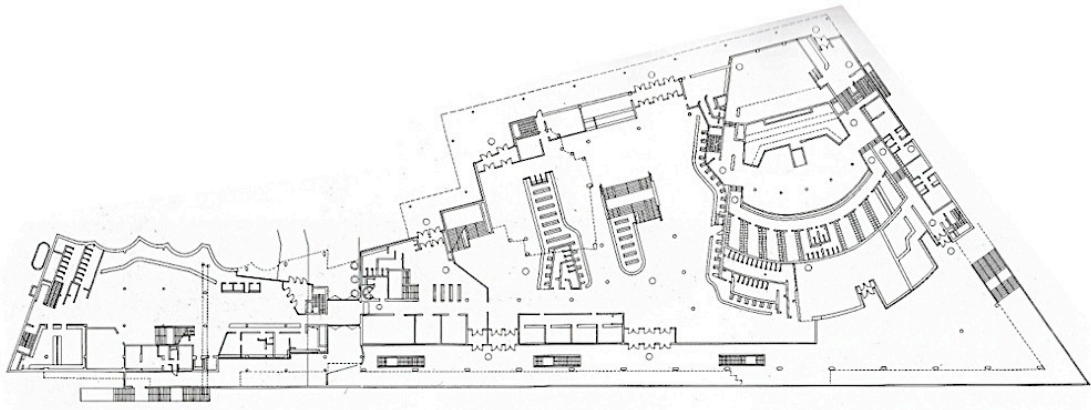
AALTO Finlandia Hall, ground floor plan
